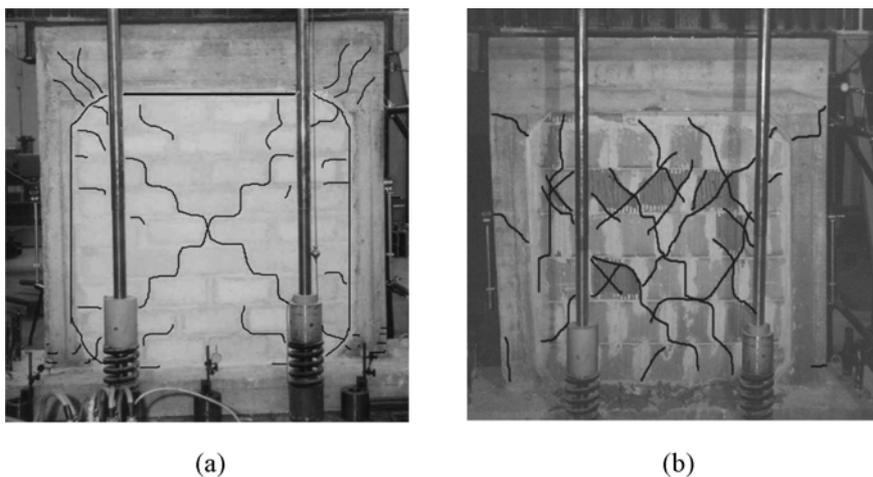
Specimens after the cyclic loading tests (a) calcarenite masonry infill, (b) clay tile masonry infill
